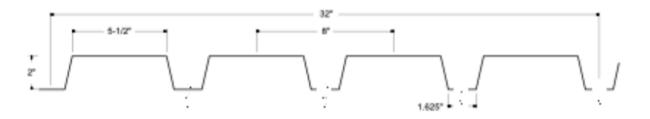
13 TMP LITE WALL 2-8-32 PANELS (4 SCREWS)
